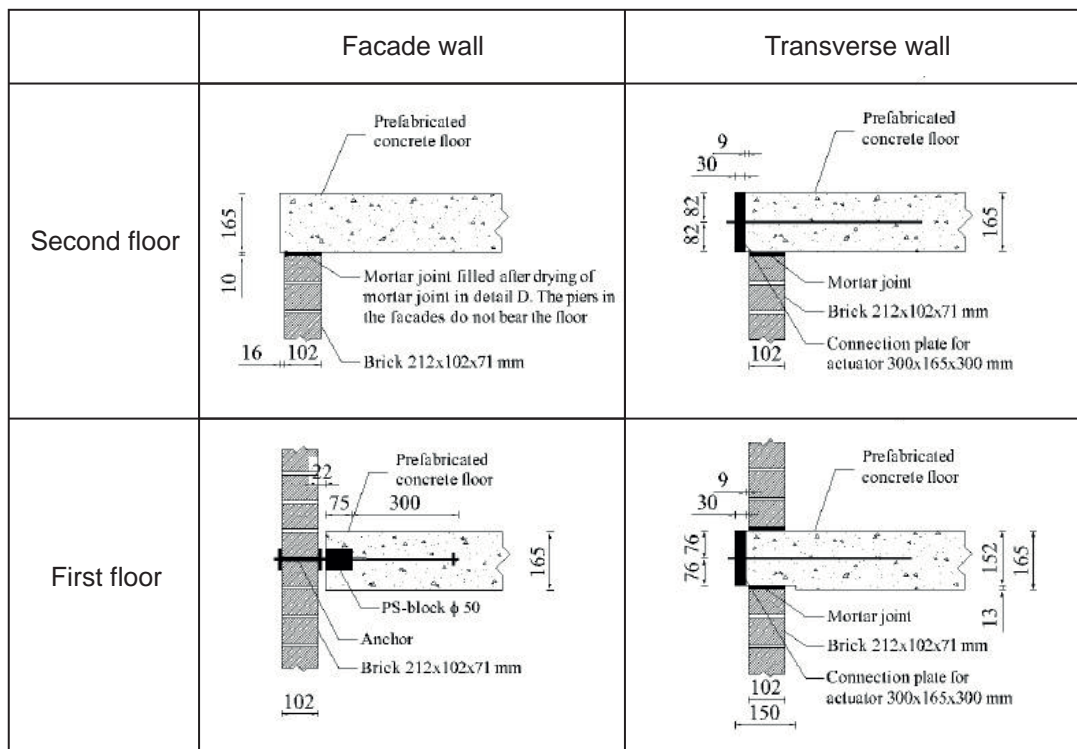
Connections between the masonry walls and two concrete floor slabs.
